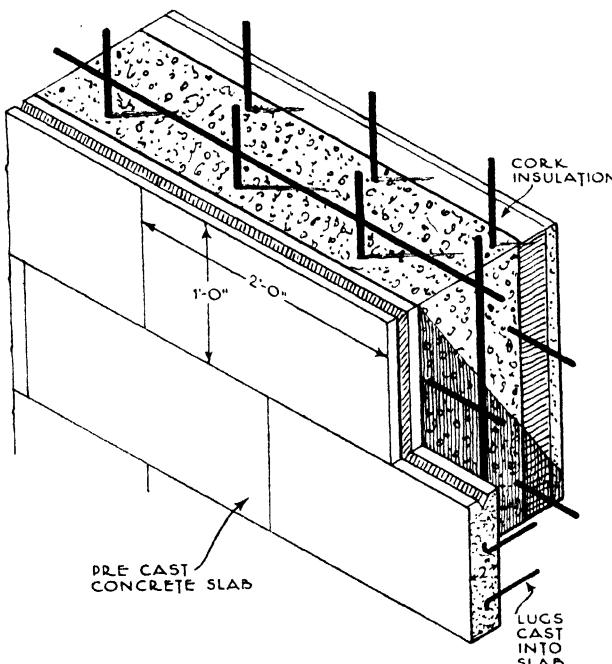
FACINGS OF PRECAST CONCRETE SLAB AT THE DORCHESTER HOTEL
